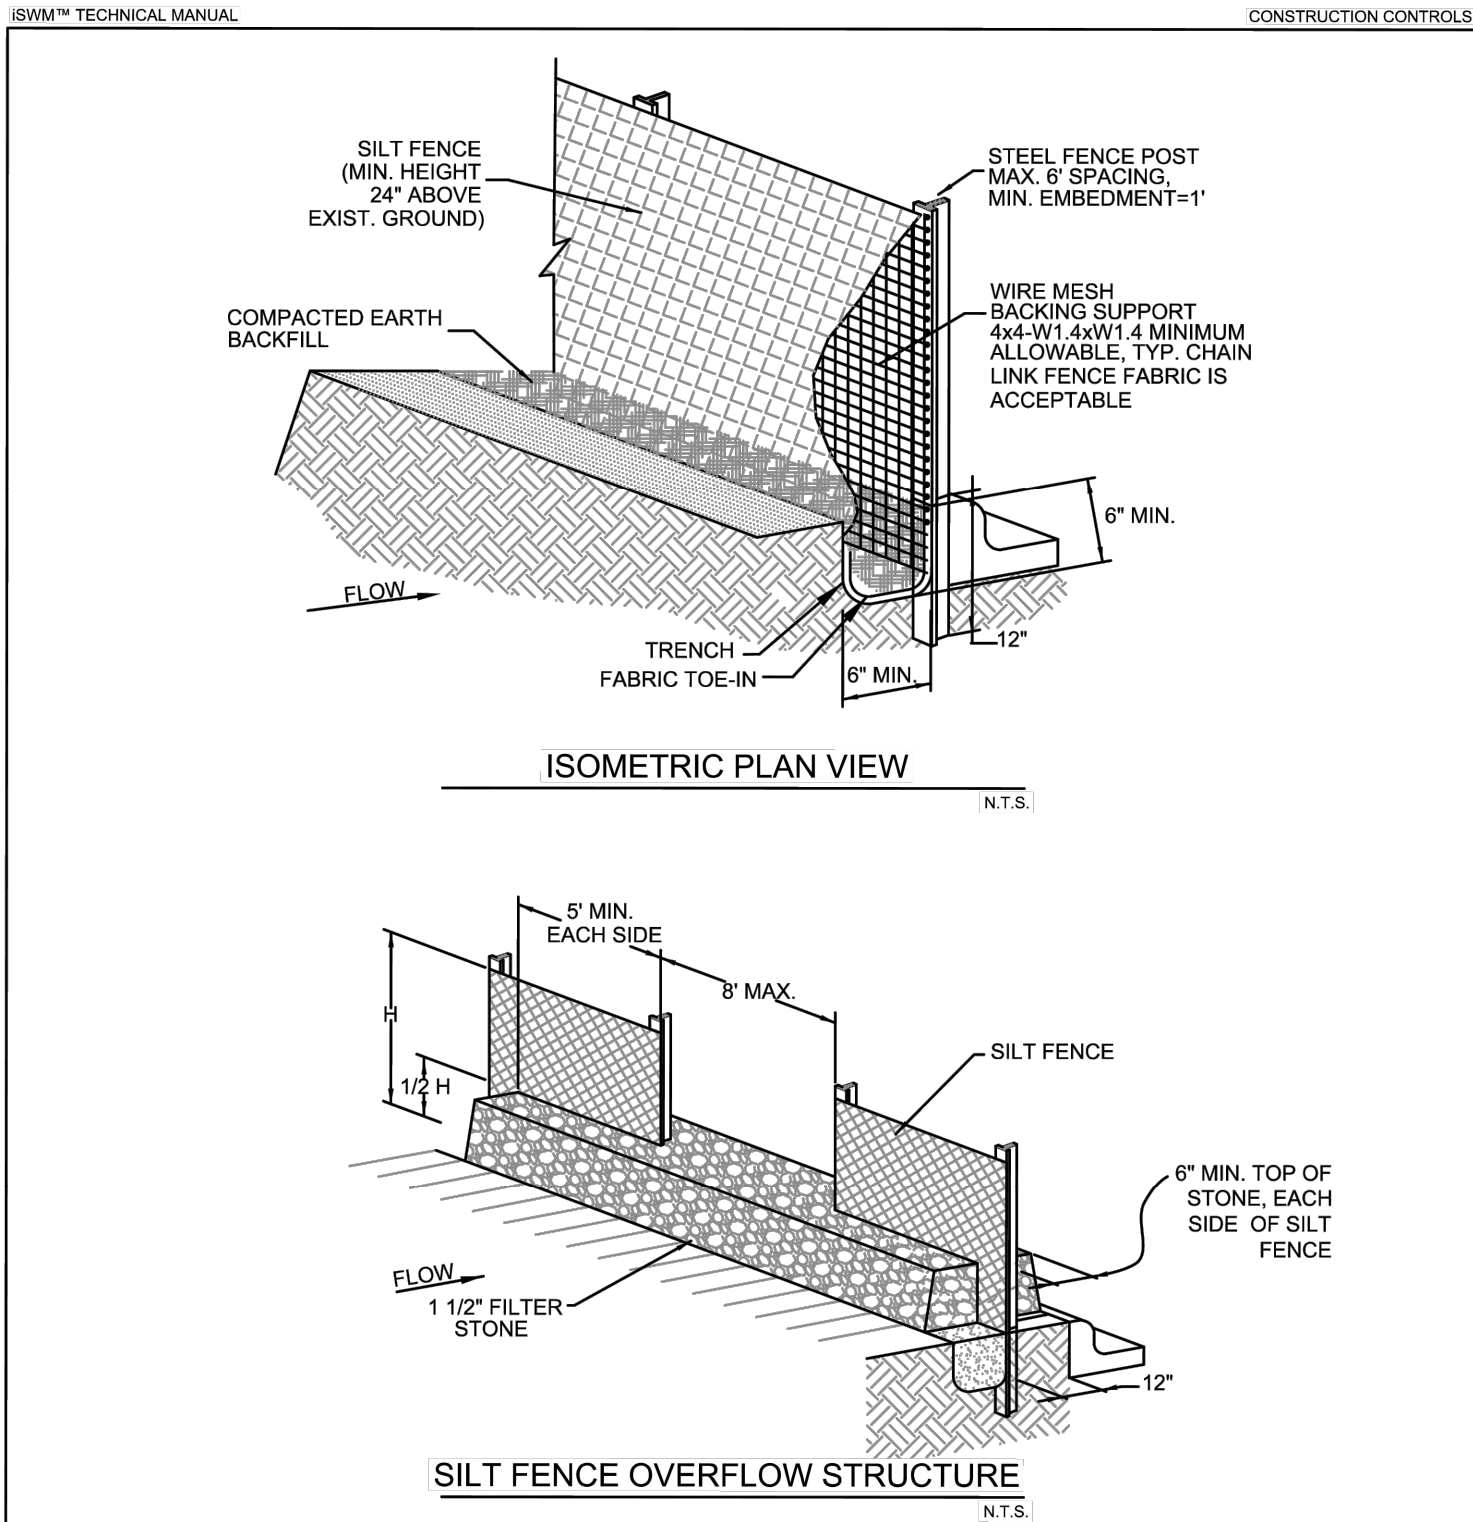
STANDARD CONSTRUCTION DETAIL - FOR SILT FENCE (1 OF 2)
